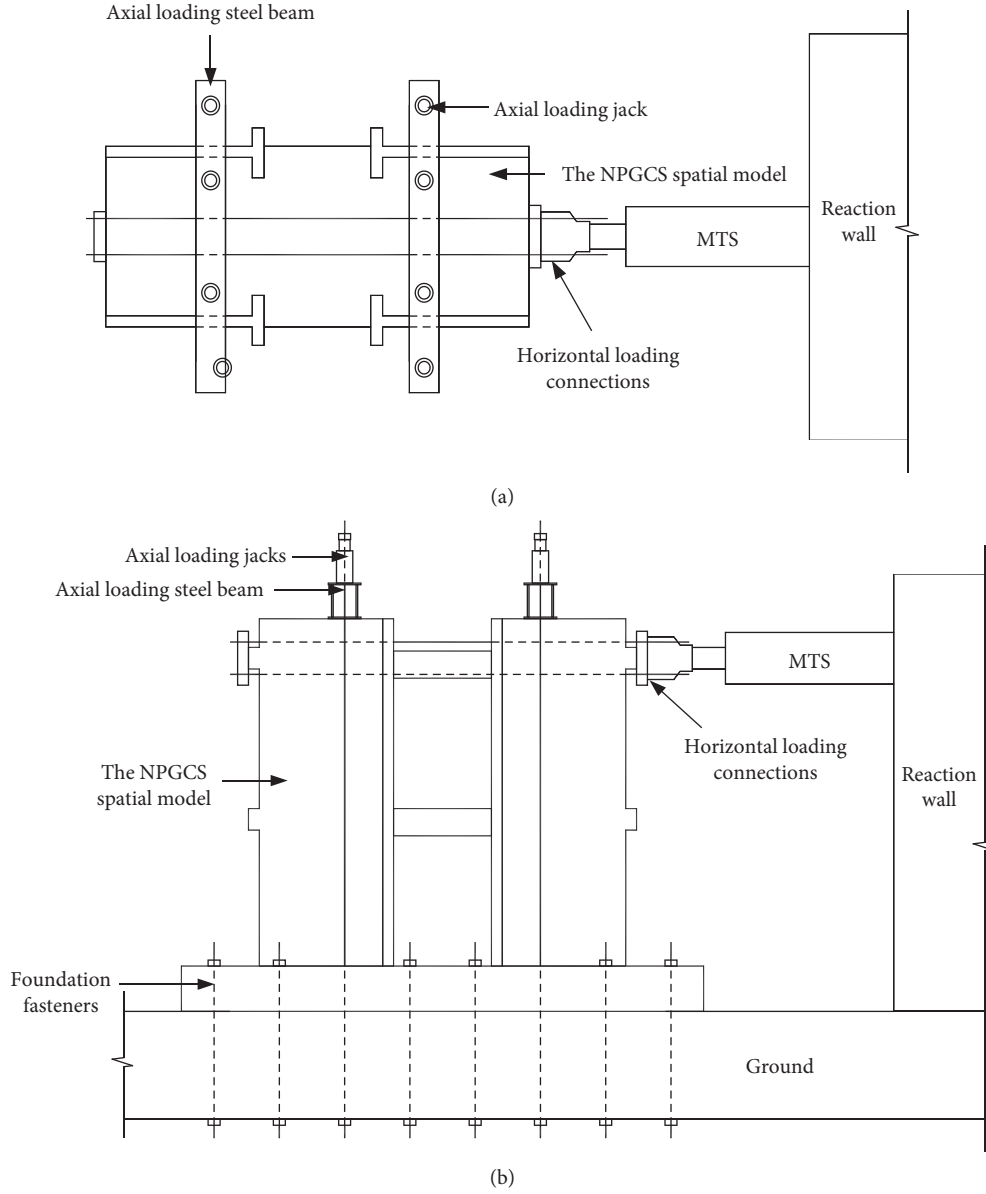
Experimental test setup. (a) Plan view. (b) Elevation view.
